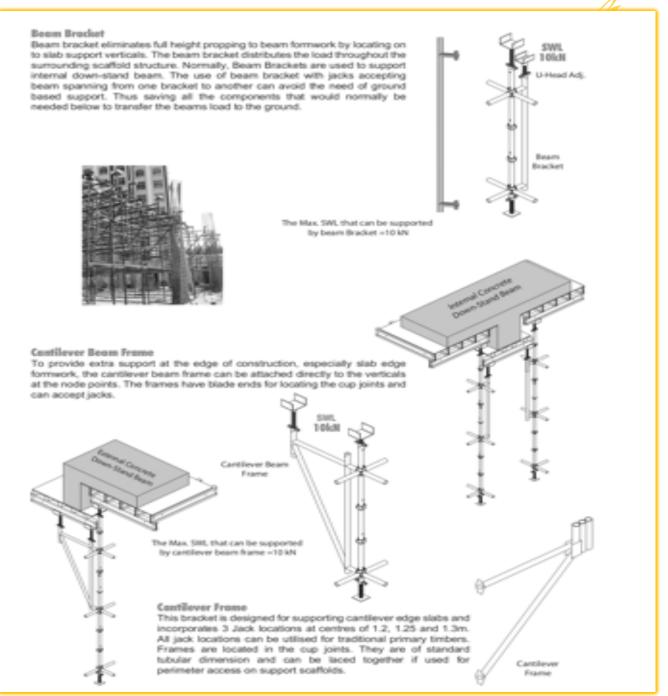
BEAM BRACKET, CANTILEVER FRAM
